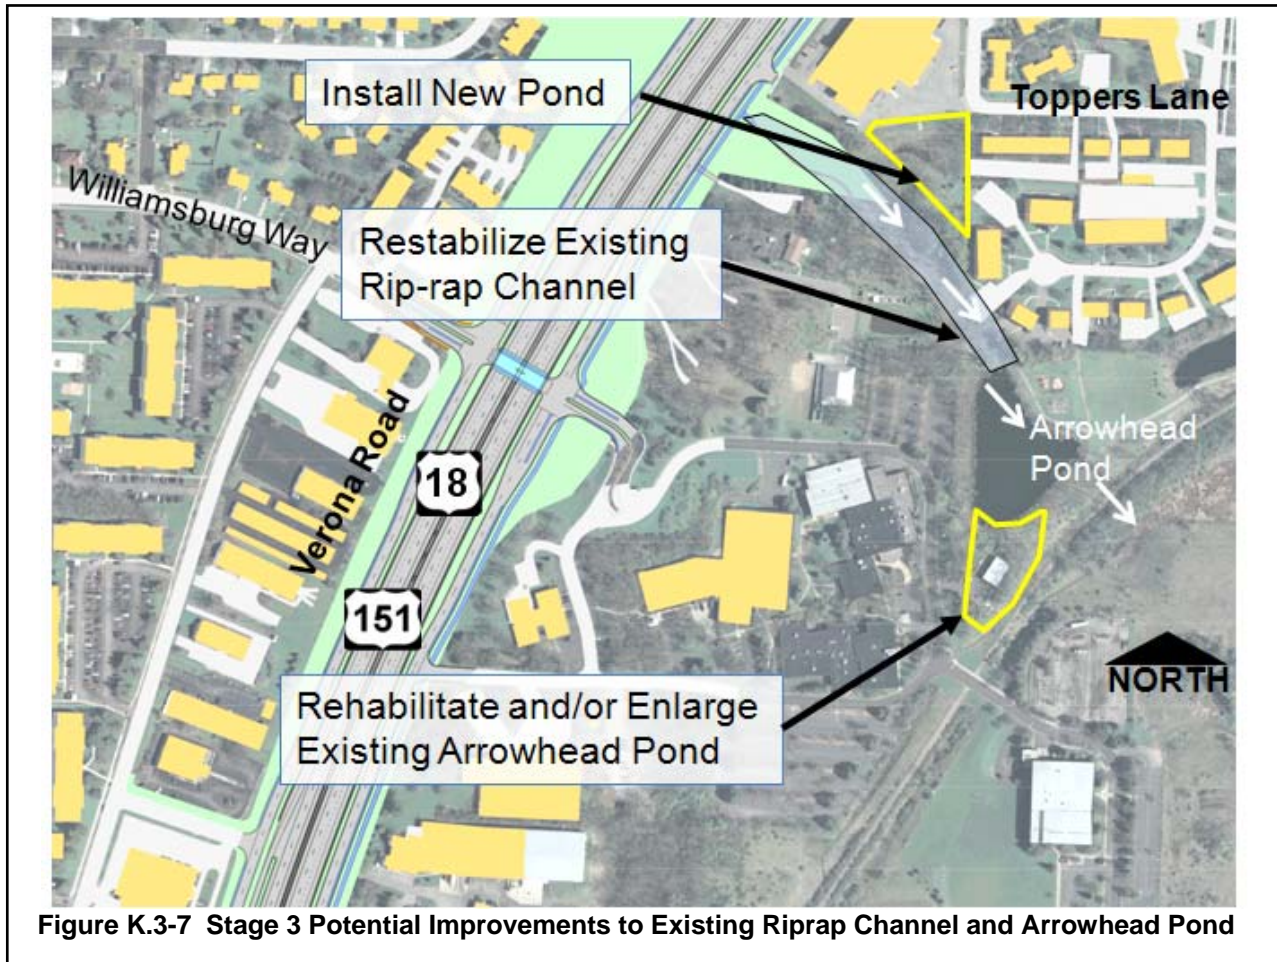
Stage 3 Potential Improvements to Existing Riprap Channel and Arrowhead Pond
